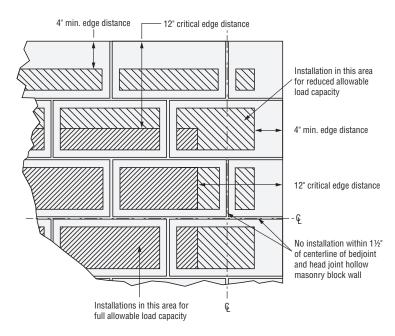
Stainless-Steel Titen HD Screw Anchor Installed in the Face of Hollow CMU Wall Construction
